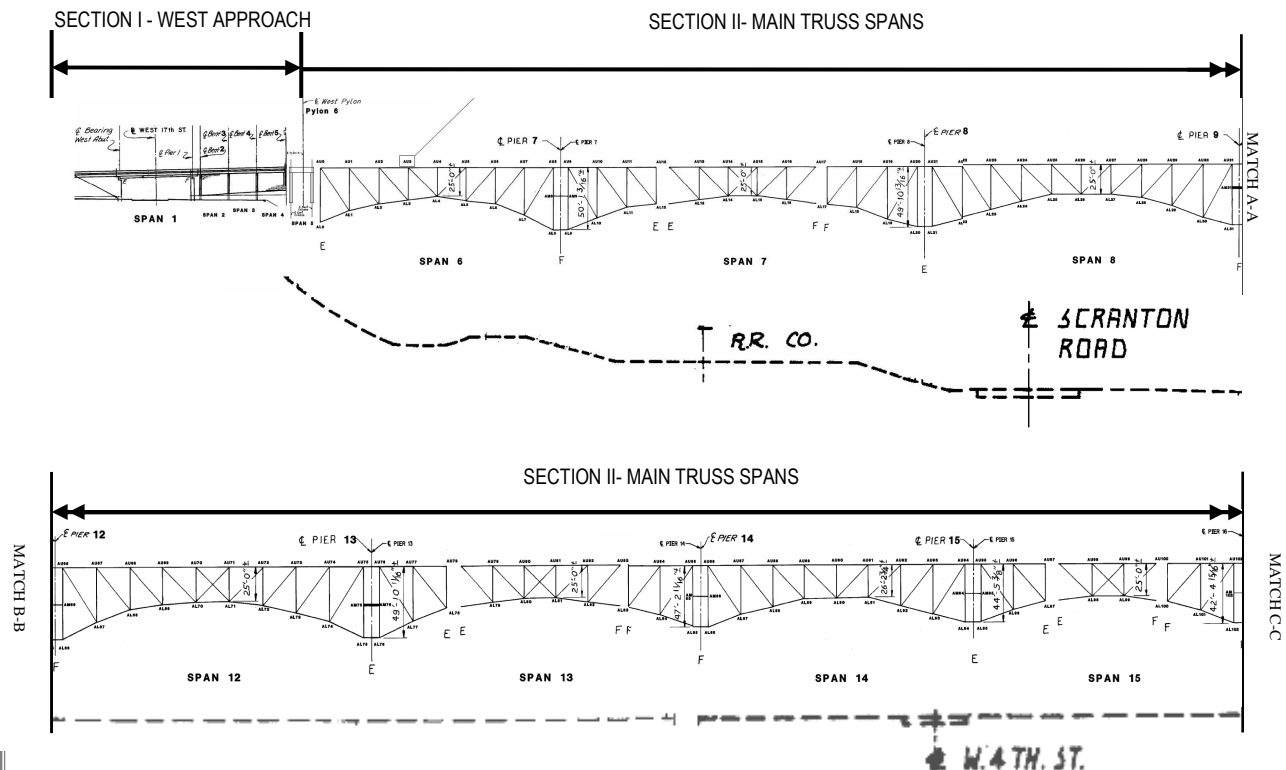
Partial south elevation of the Lorain-Carnegie Bridge.
